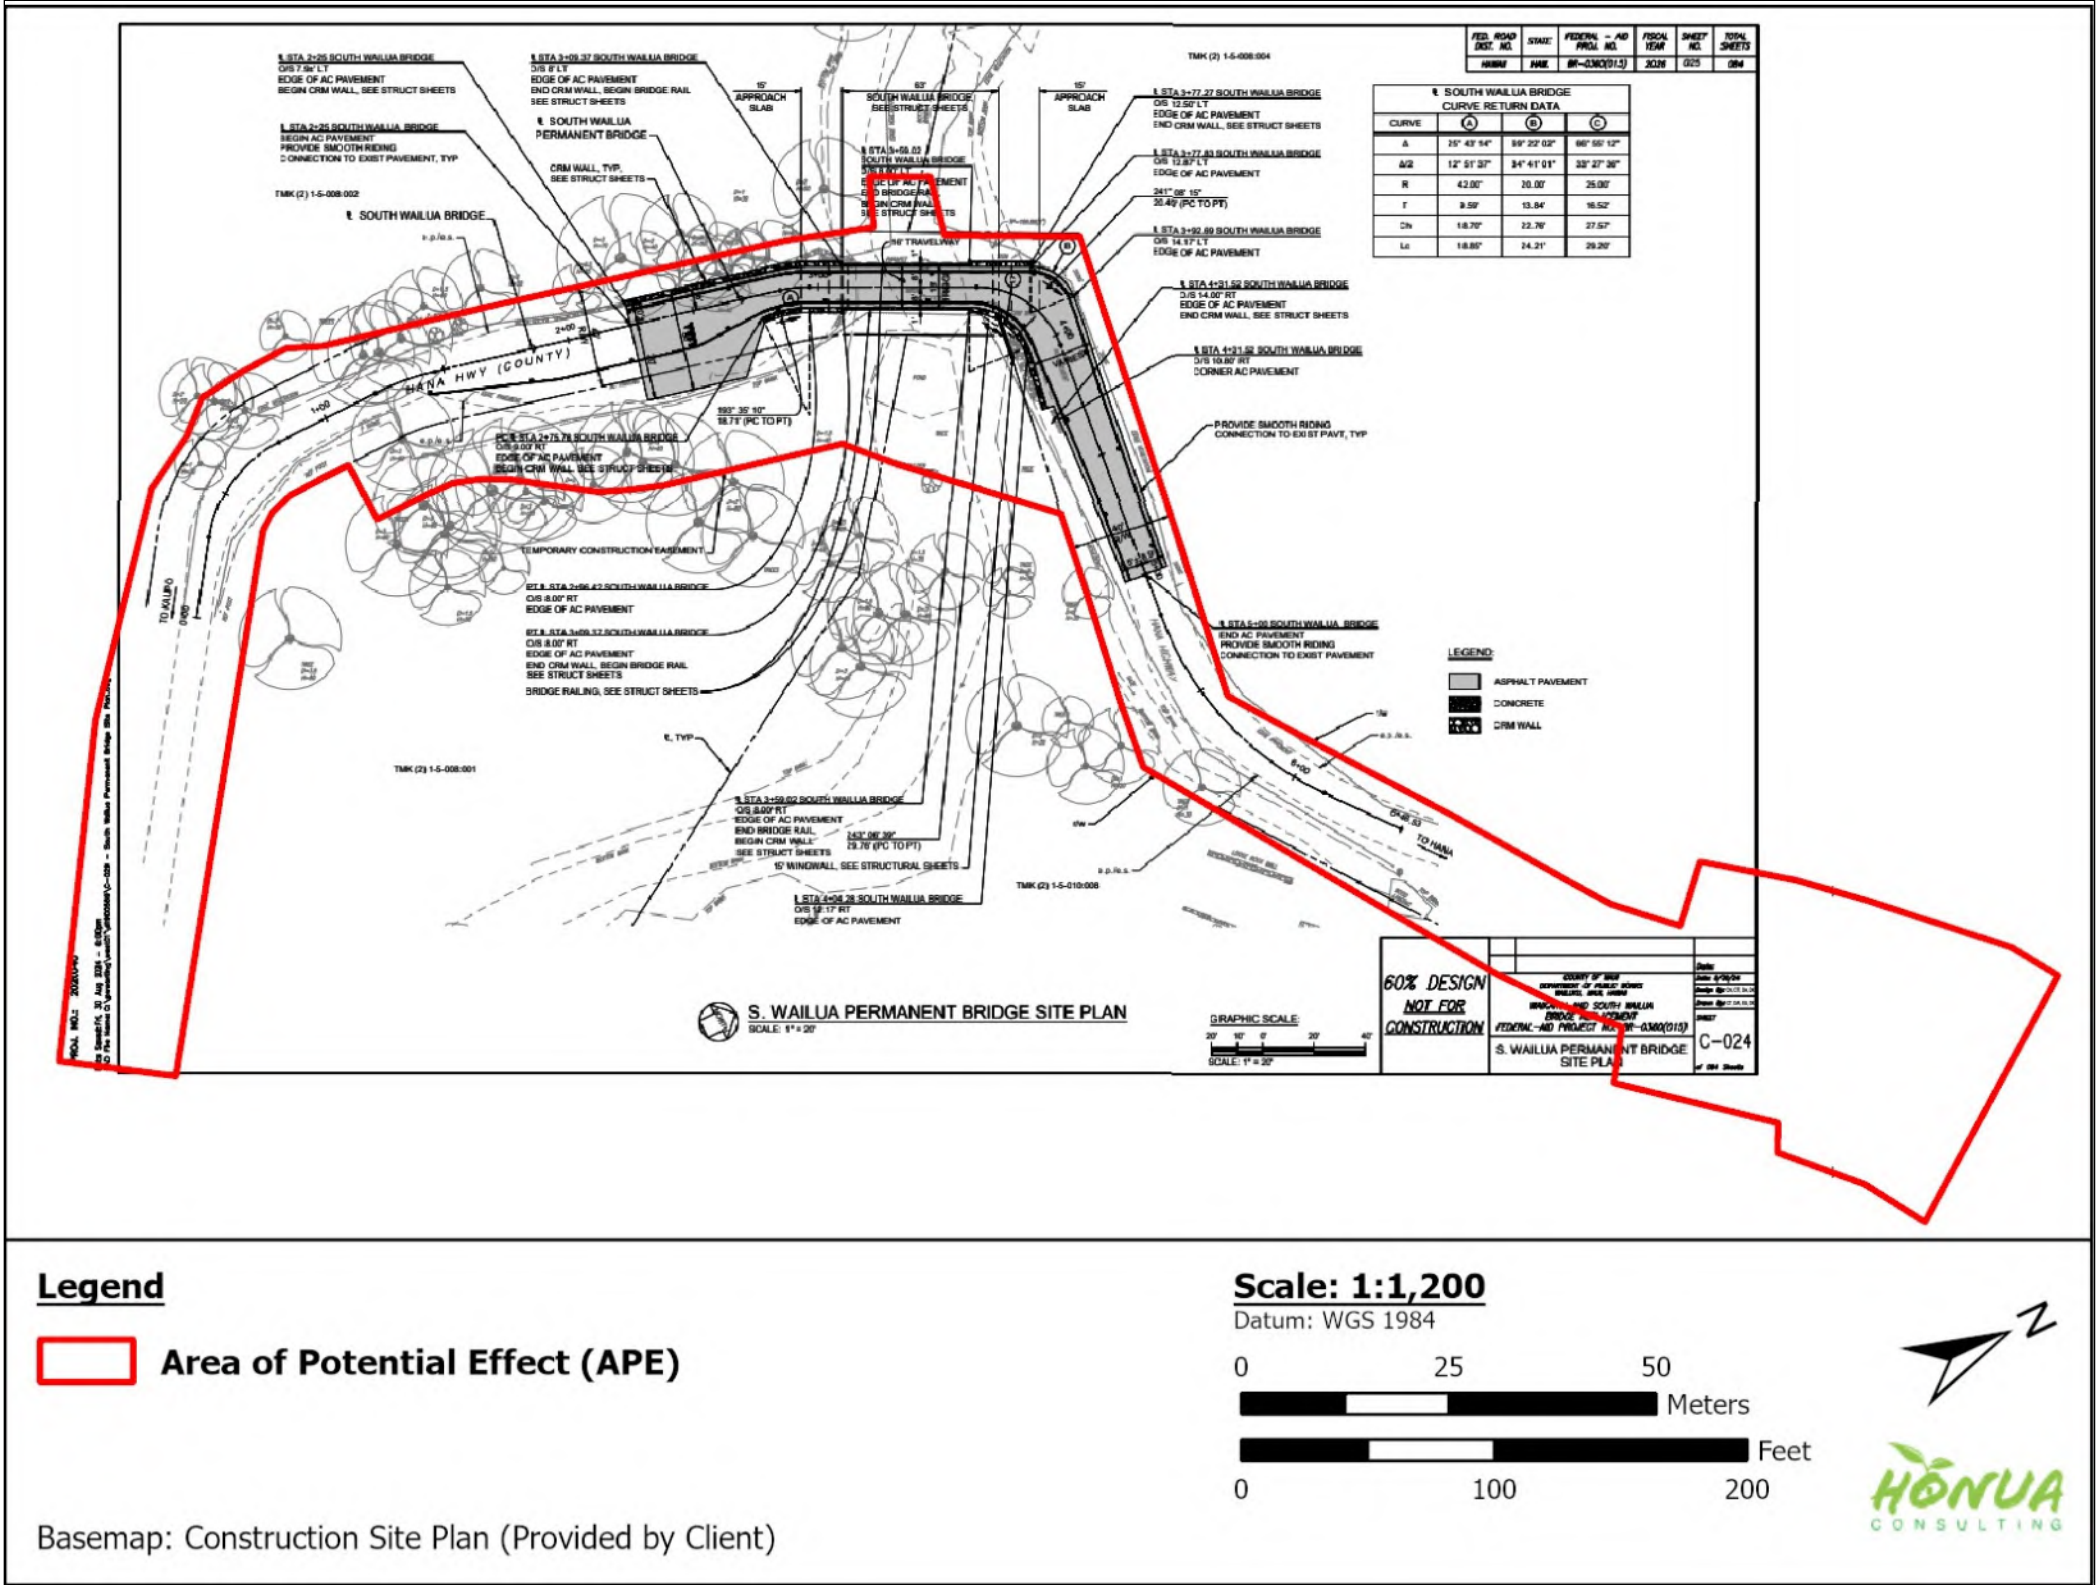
Construction site plan for South Wailua Bridge APE (base image provided by client); note, the area of construction and potential ground disturbance is indicated by the limits of the construction drawing; the APE extends further than the construction drawing to indicate areas where temporary traffic control warning signage will be placed
